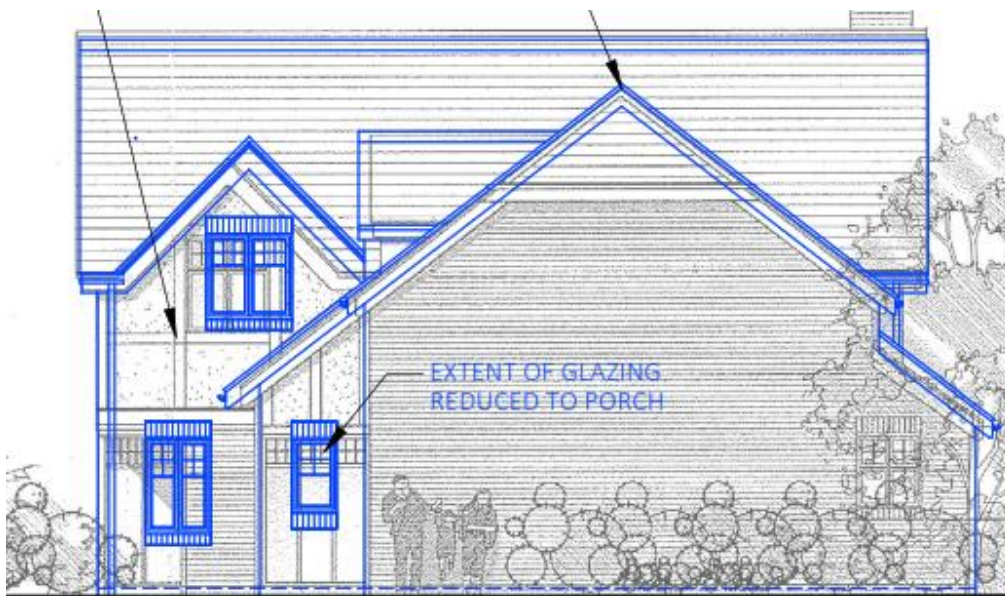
Proposed east side elevation (in blue) overlaid over extant permission
